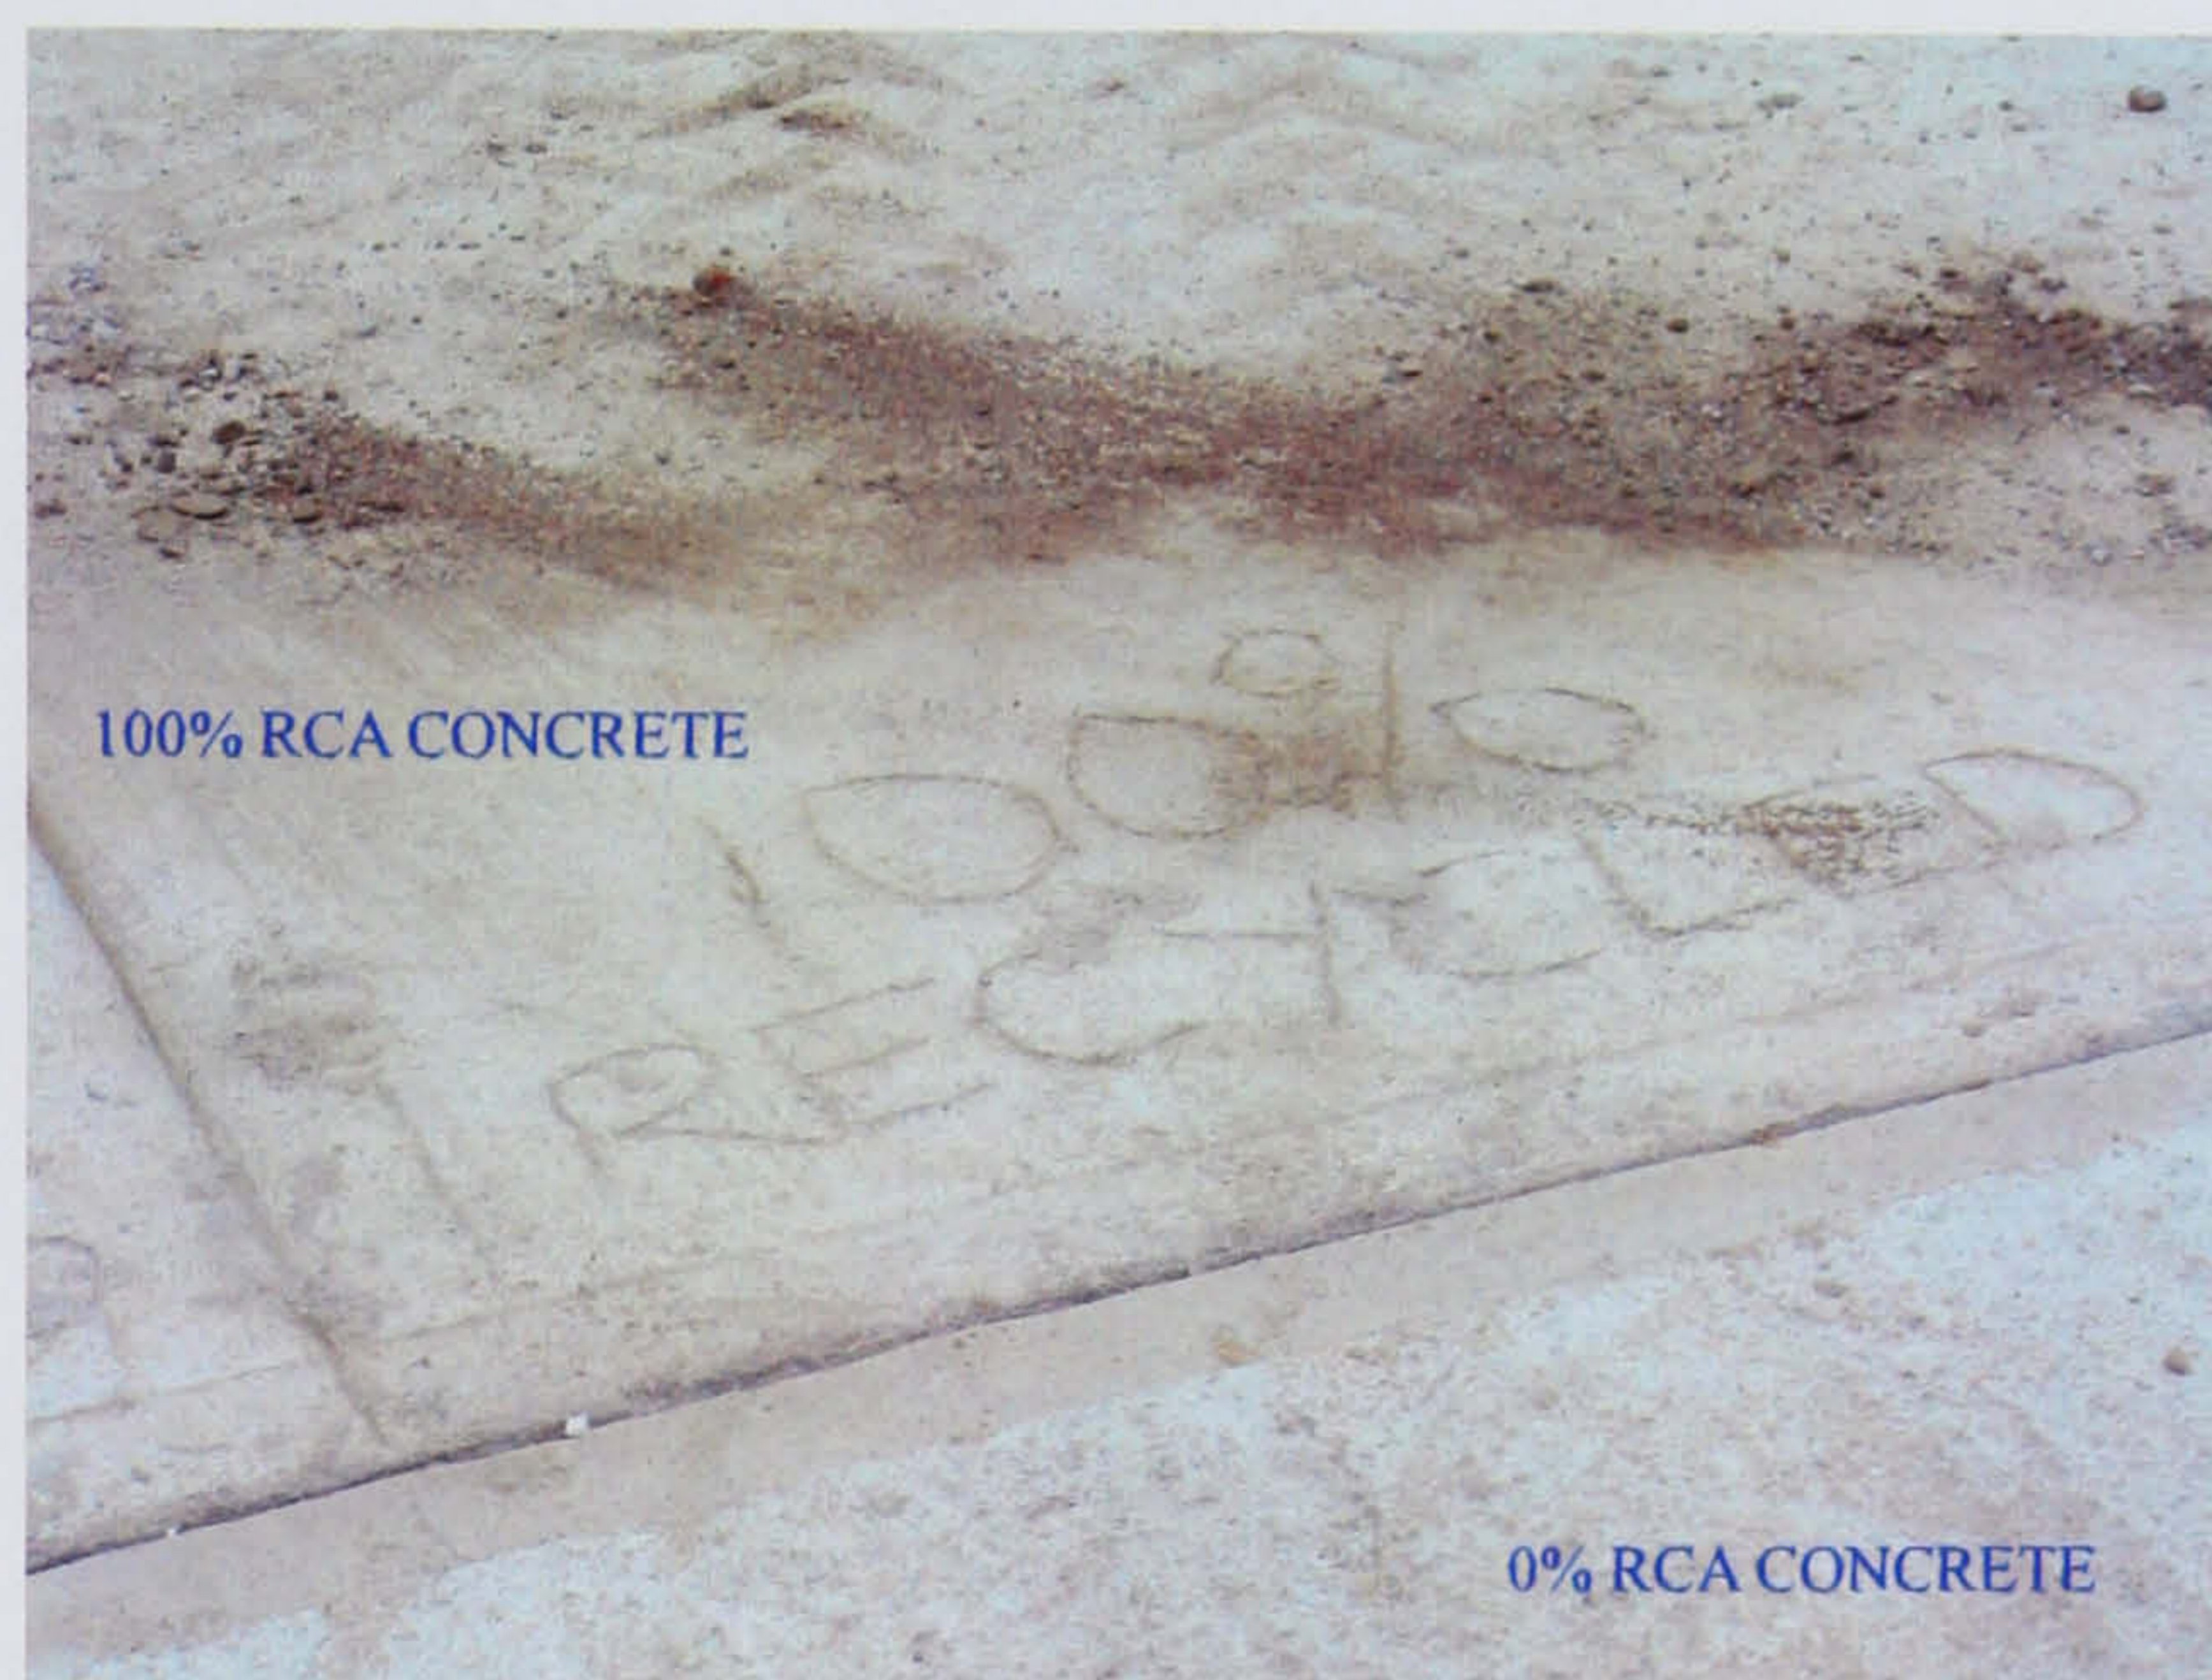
Detail of pavement section and expansion joint detail used in the second demonstration.
